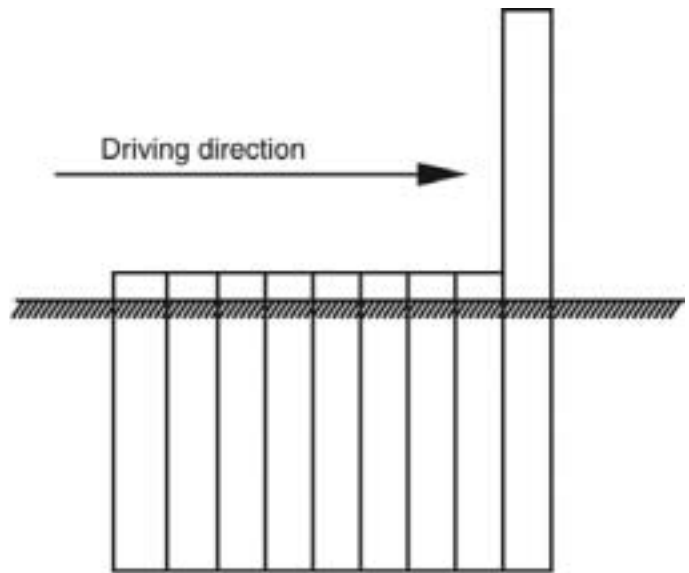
Set-and-drive Method – Each steel sheet pile is driven to full depth before setting the next sheet pile.
